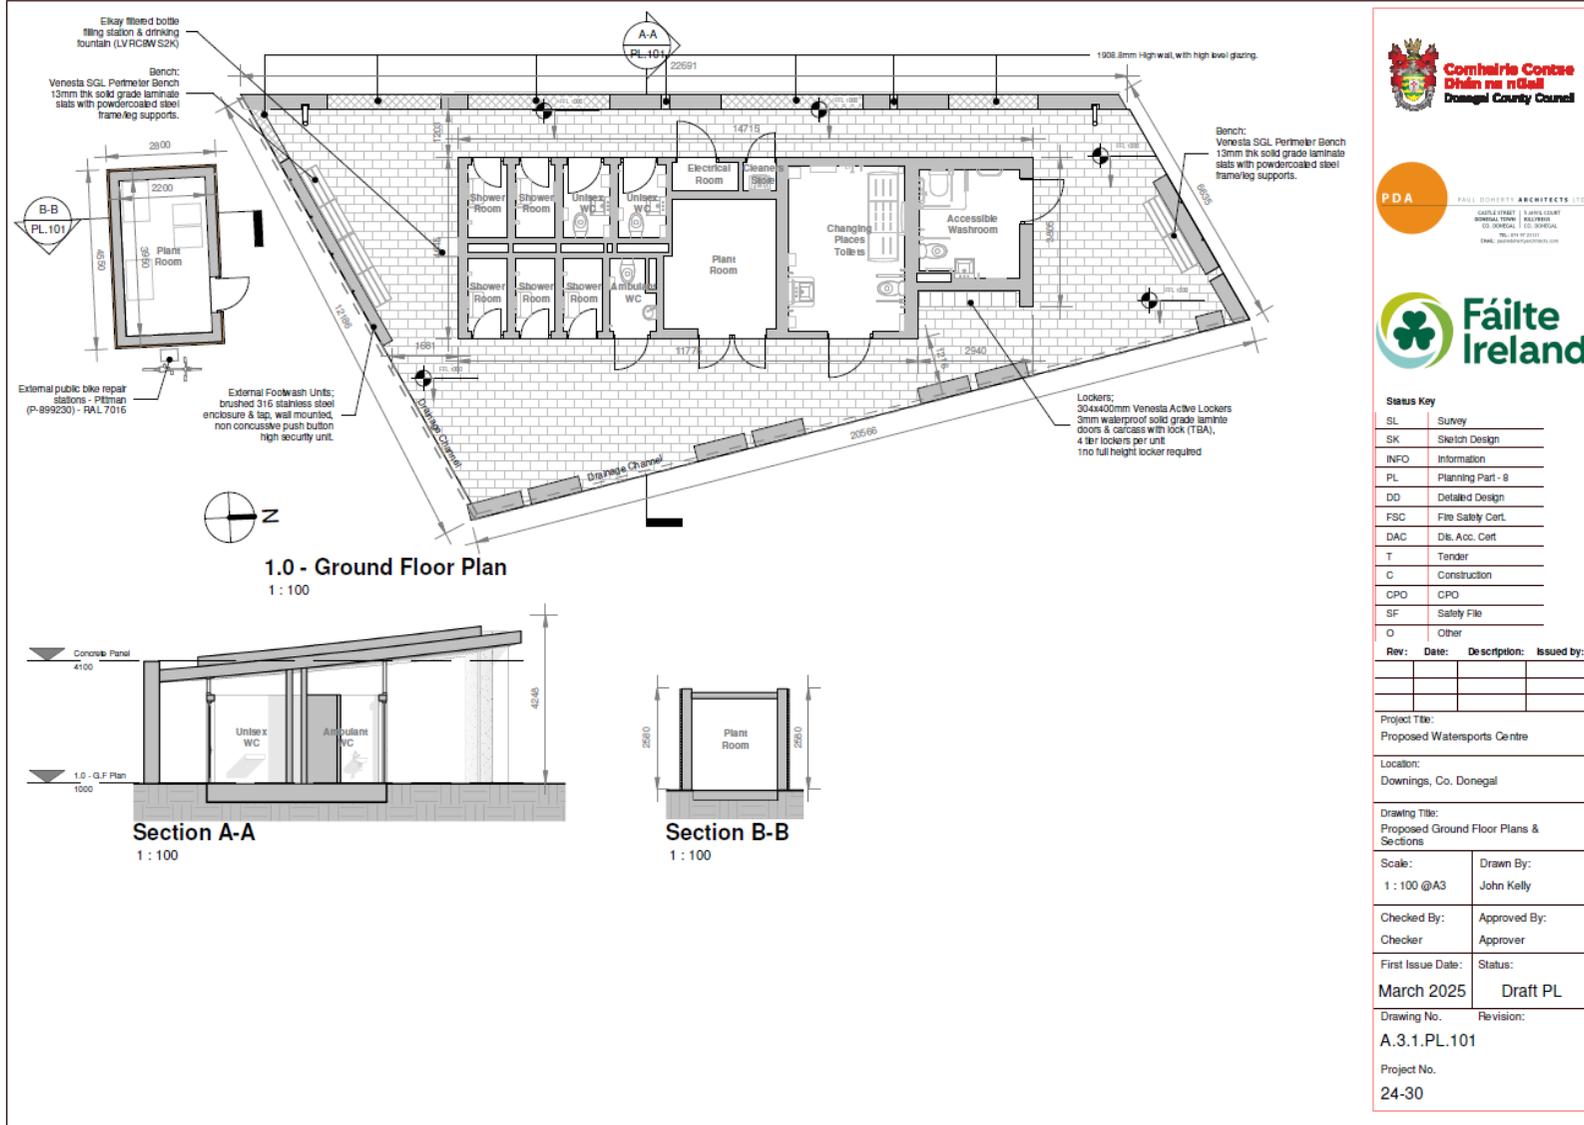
Proposed ground floor plans and sections as supplied by Paul Doherty Architects Ltd. (Not to scale).
